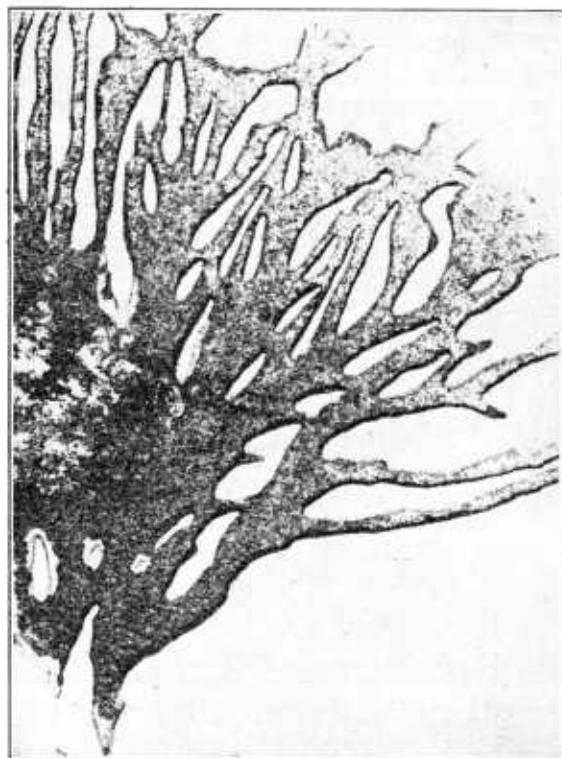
Pressed wood-pulp tile mined by subterranean termites infesting the building, Biloxi, Miss.
